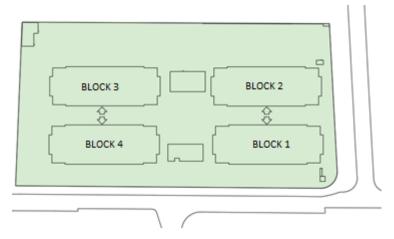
Simplified floor plan of the enterprise. Source: Construction company (2015)
